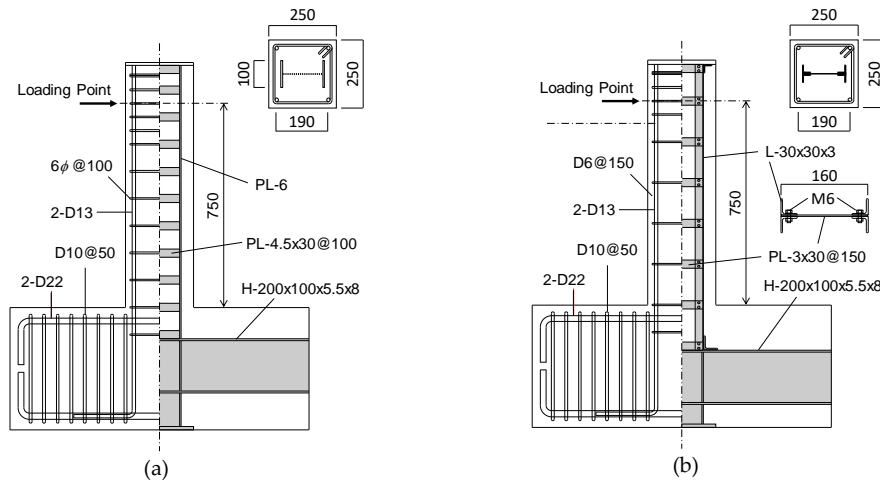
Reinforcement and steel details of the test specimen. (a) Weld-connected specimen (W Series); (b) Bolt-connected specimen (B Series).
